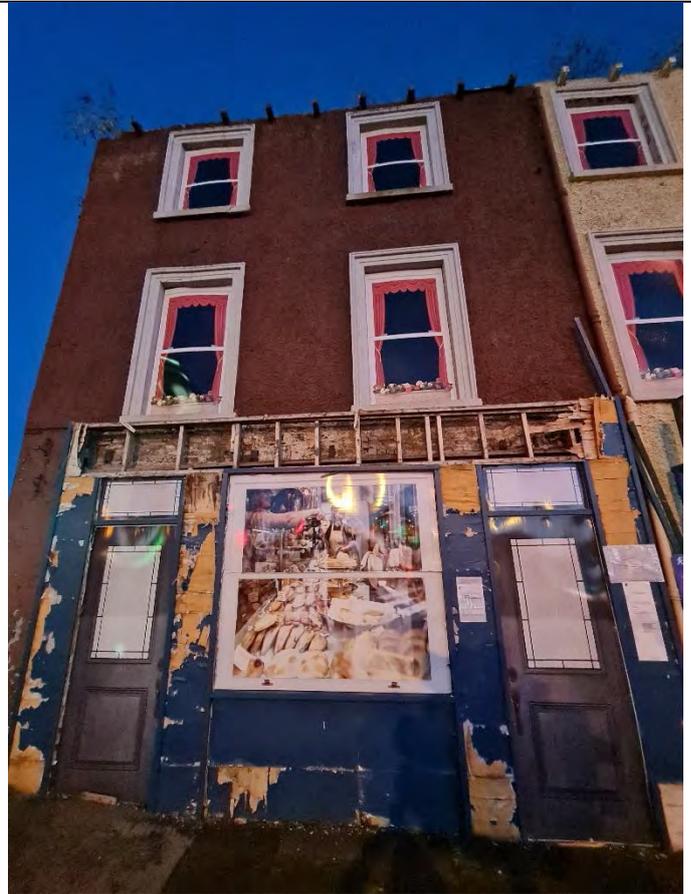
Front façade of protected structure CT94, showing replacement shopfront (now in poor repair)
